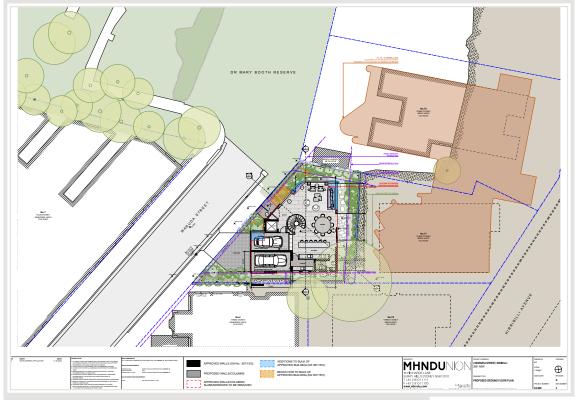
Typical floor plan of the proposed design by MHNDUnion Architects
